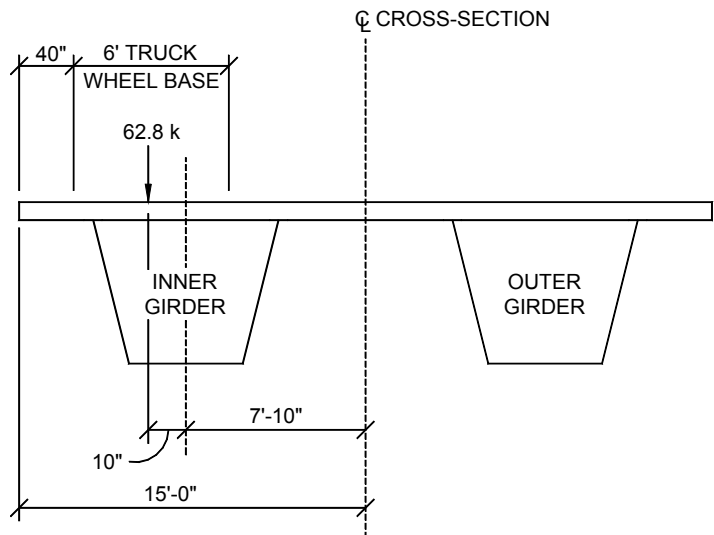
Live Load Test Setup on Bridge K (Inner Run)
